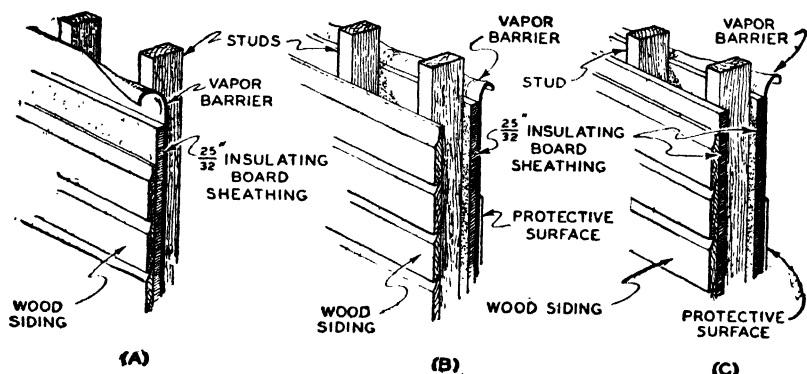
Three Methods of Insulating Frame Walls with Insulating Board: (A) One Layer of Insulating Board on Outside of Studs, with or without Other Exterior Finish; (B) One Layer of Insulating Board Sheathing on Inside of Studs, with Wood Siding or Other Exterior Finish; (C) Two Layers of Insulating Board Sheathing, One on Each Side of Studs with Wood Siding or Other Exterior Finish over Outside Layer
